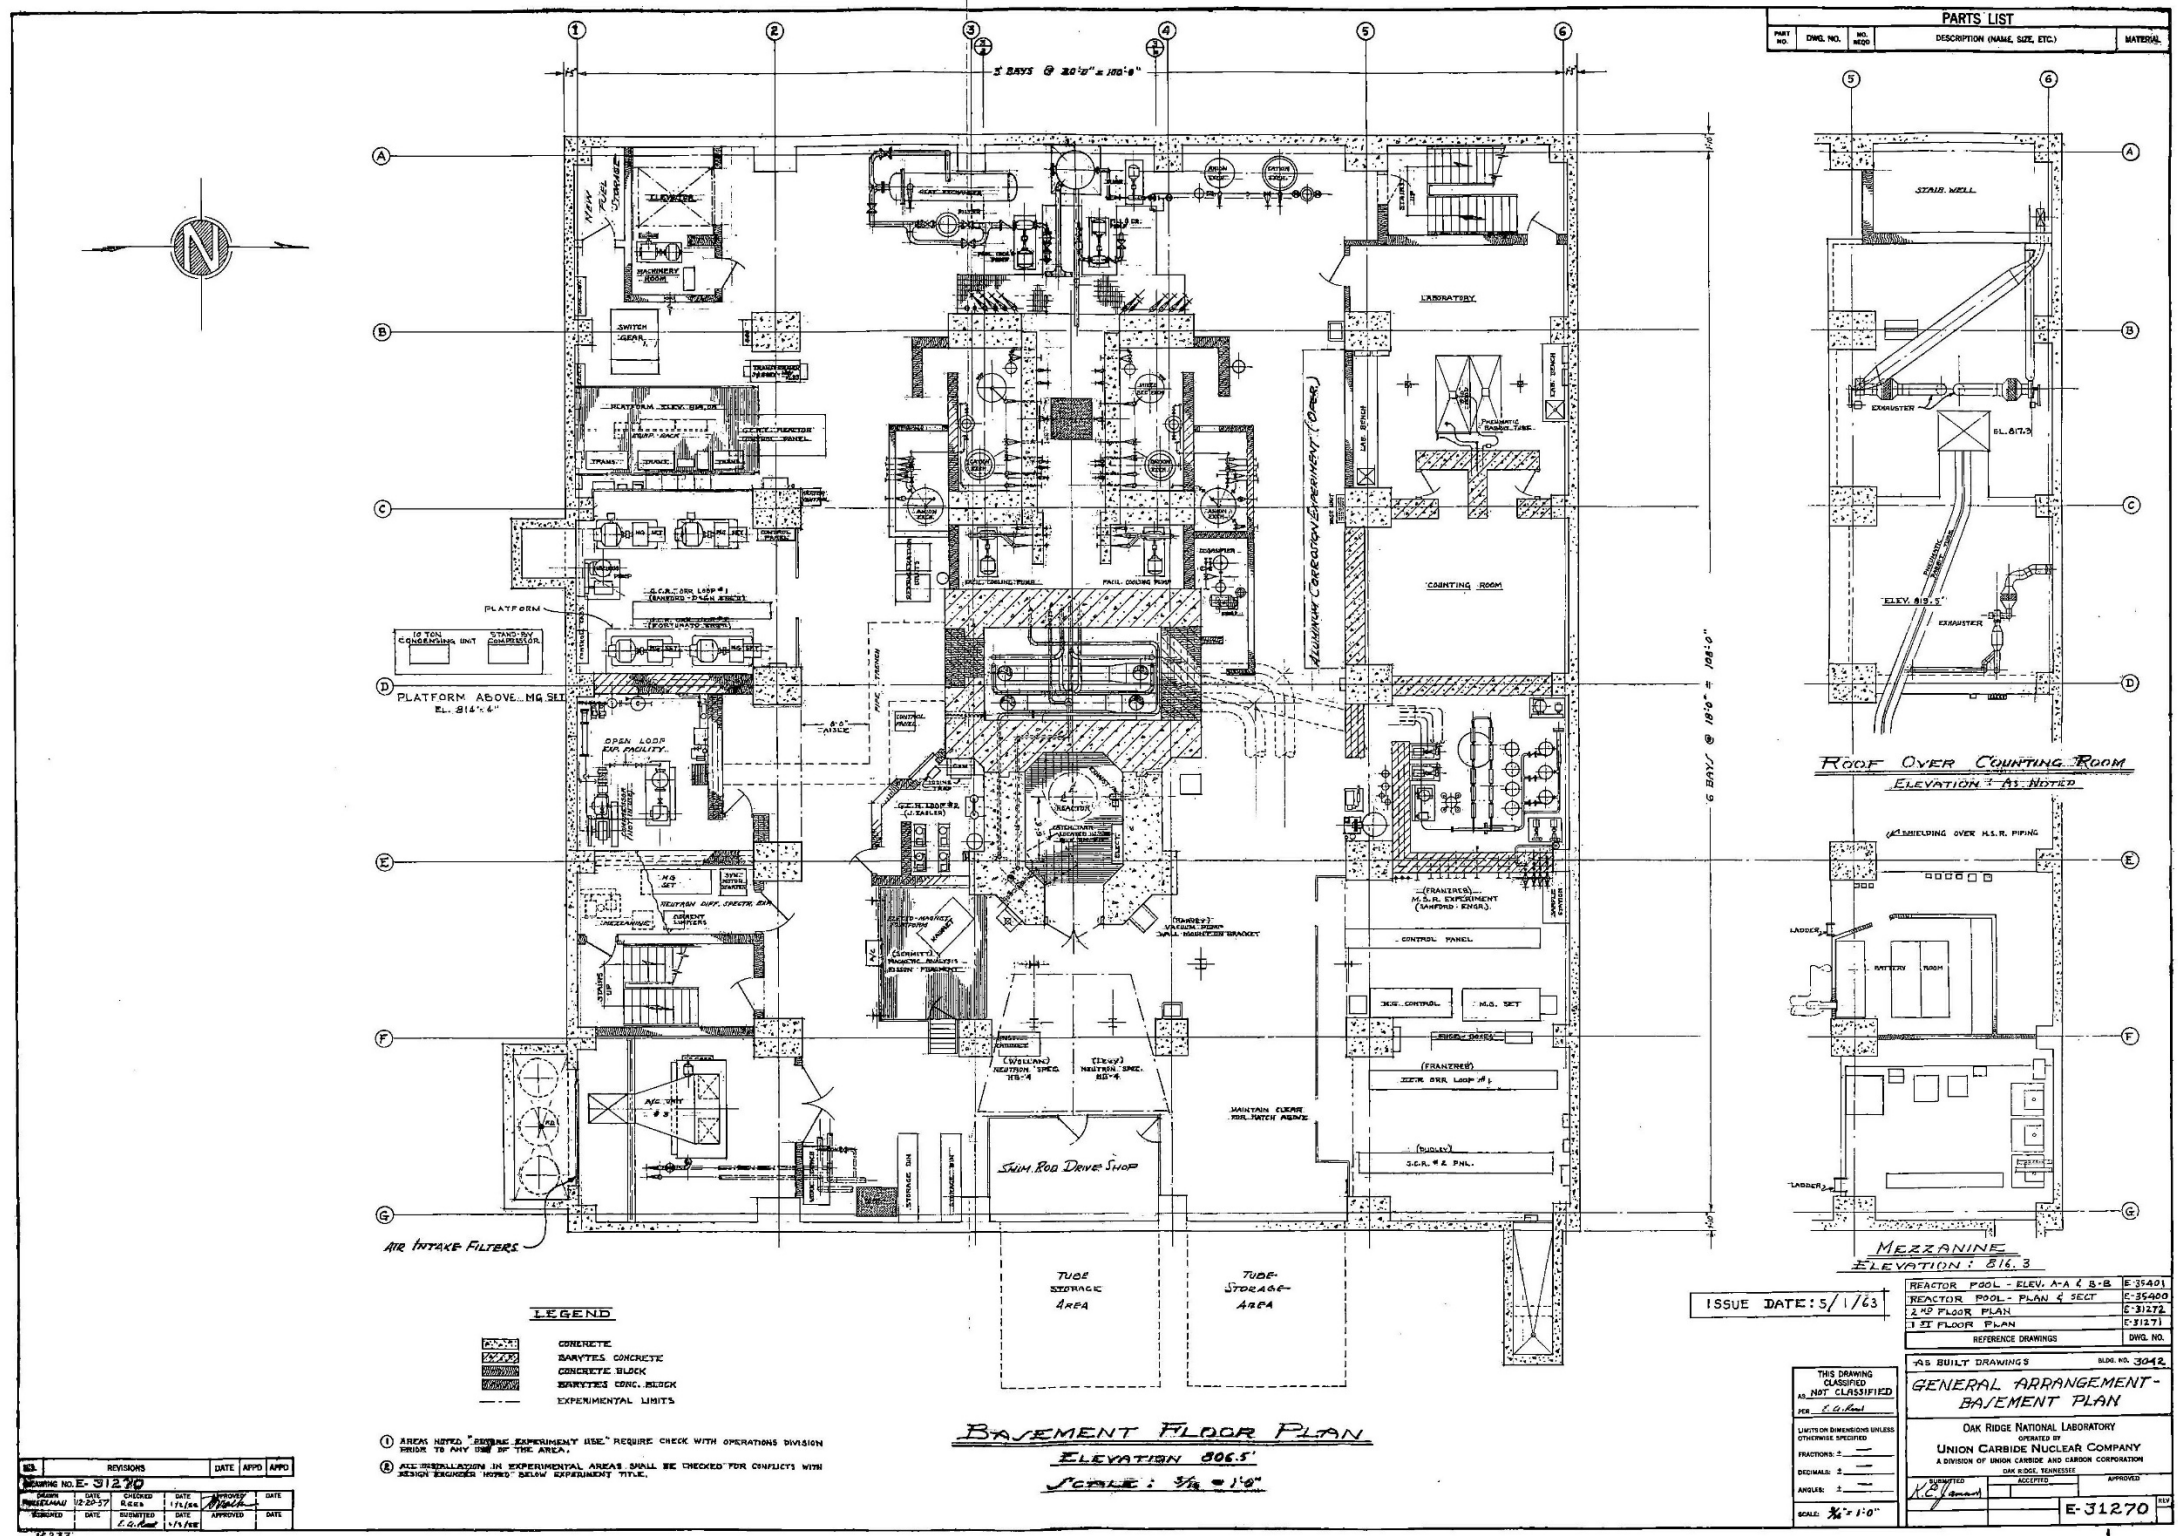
As built drawing showing the general arrangement of the basement plan in Building 3042 (Oak Ridge National Laboratory, December 20, 1957 [drawn date], May 1, 1963 [issue date, with revisions]).
